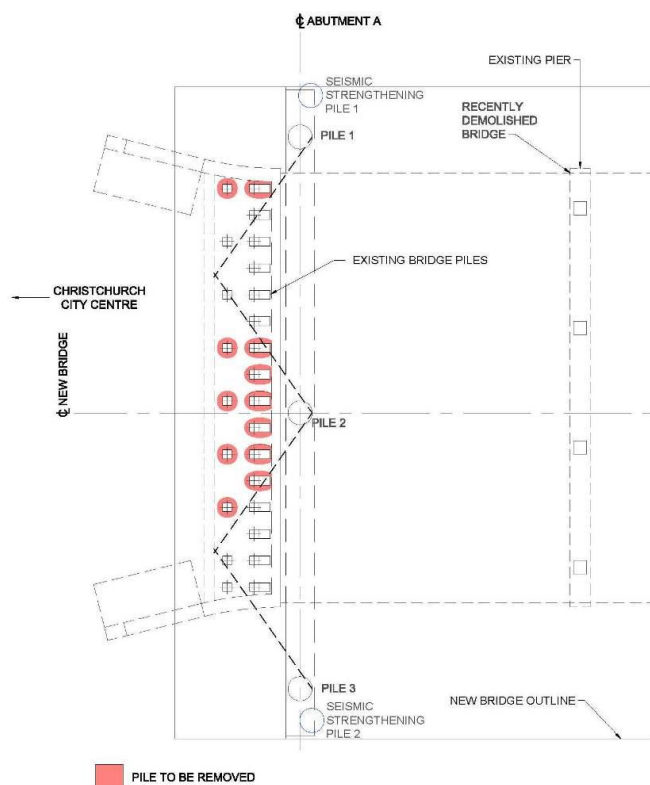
Core group of piles at the City abutment considered for removal, (Mt Pleasant abutment similar).
